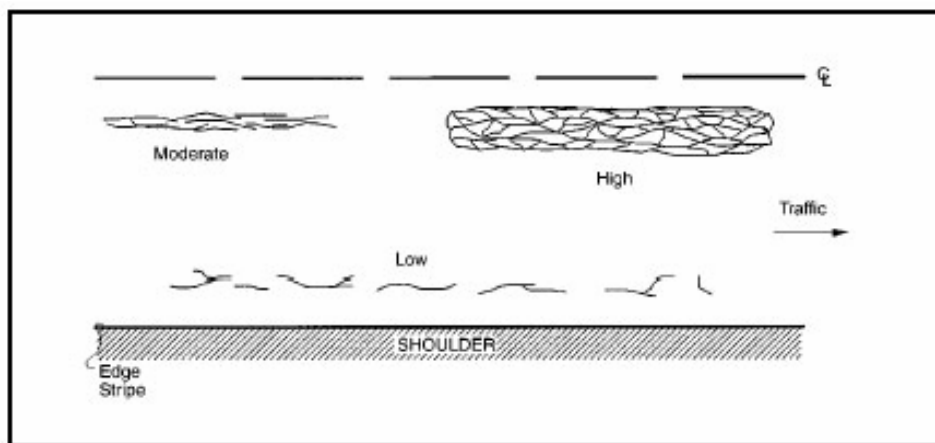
Bottom-up Fatigue Cracking in the Flexible Pavement Structure
